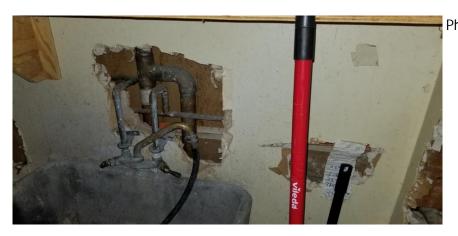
View of asbestoscontaining drywall joint compound observed to be in poor condition in Room 314. Repaired
